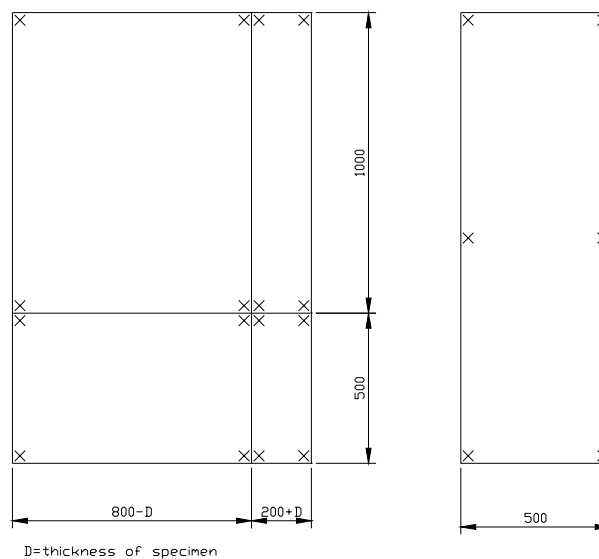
Positions of fixings, specimen with vertical and horizontal joints.
